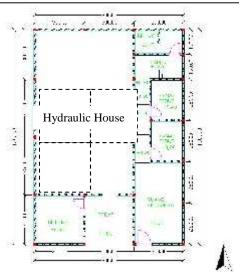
The Plan of Mrs. Hanifah's house with the additional scheme of hydraulic house
